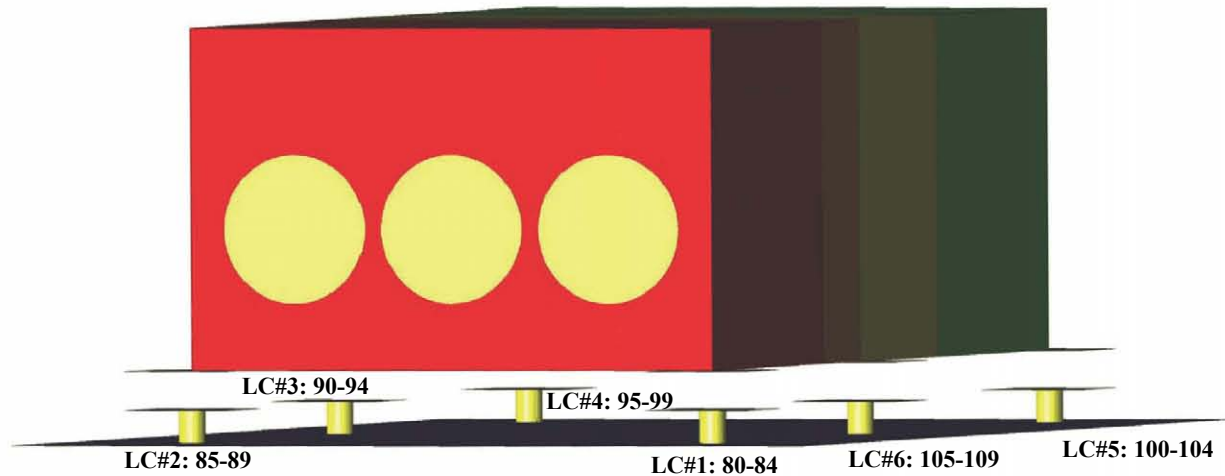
Arrangement of Six Load Cells under Test Specimen, Channels #80 to #109, Phase I: Isolated Test Specimen
